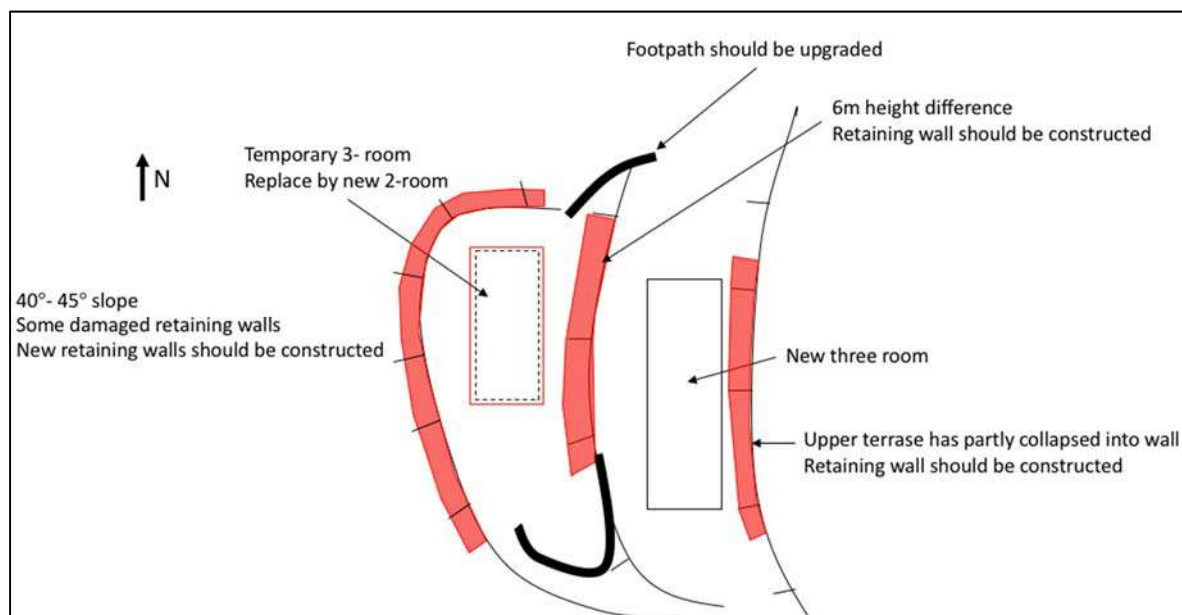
Plan view - Chirkun Than. The height difference between newly built- and temporary school building is 6m. There should be carried out extensive work with retaining walls at the site. There is need for a gabion wall both behind the newly built house, between the two houses and in front of the planned building.
